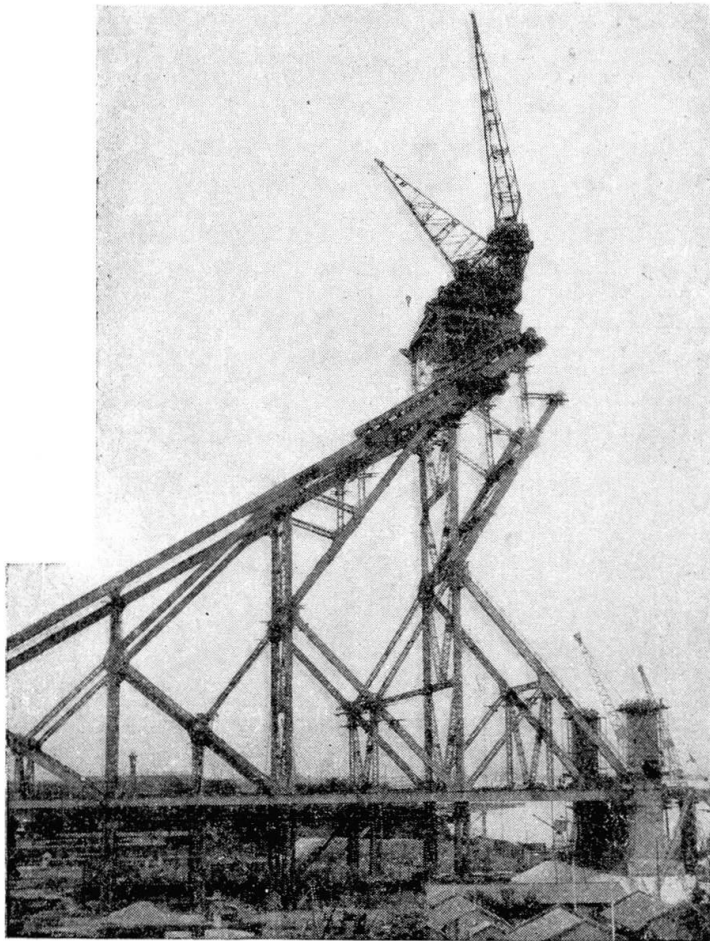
Erection of Howrah Anchor Arm nearly completed.
